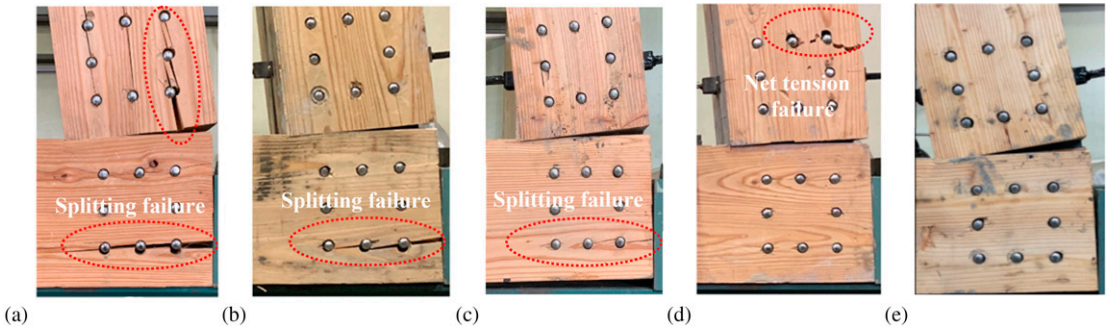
Failure mode of moment resistance joint specimens after test: (a) general failure mode of control specimens, (b) Type-A1, A2 specimens, (c) Type-A3 specimen, (d) Type-B1 specimen, and (e) Type-B3 specimen.
